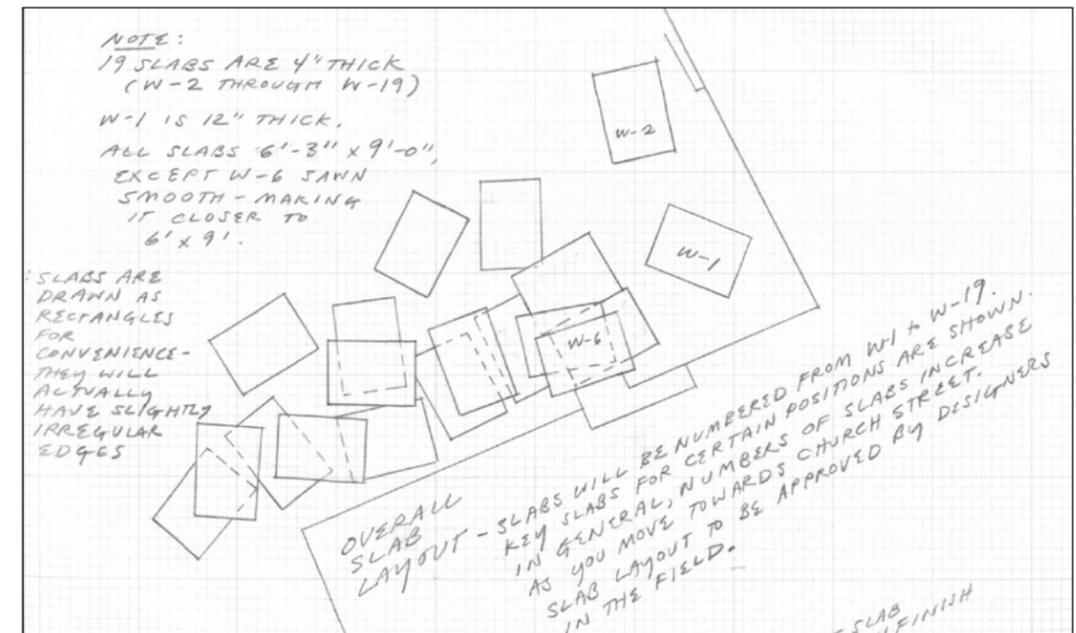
West Garden, Rapson Hall, study for Site Index, placement of anorthositic gabbro slabs, Rebecca Krinke, pencil sketch, 2004.
